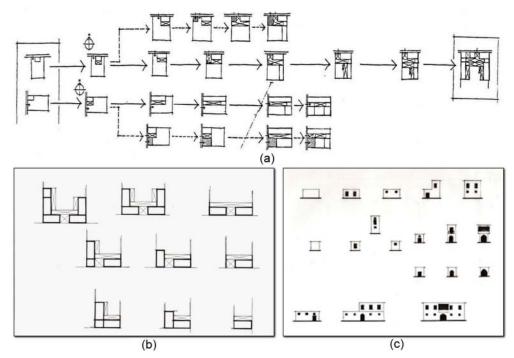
(a) Floor plan typologies for Nicosia by D. Danilo represent the floorplans of different building types found in Nicosia. They present typical plots of land and the way volumes were built in the plot around the open space of a garden. (b) Floor plan typologies for Nicosia from (Iliadou 2011). These diagrams represent a simplified form of the floorplans presented by D. Demi. These diagrams show the way built volumes where organised along the street. (c) Facade typologies.
